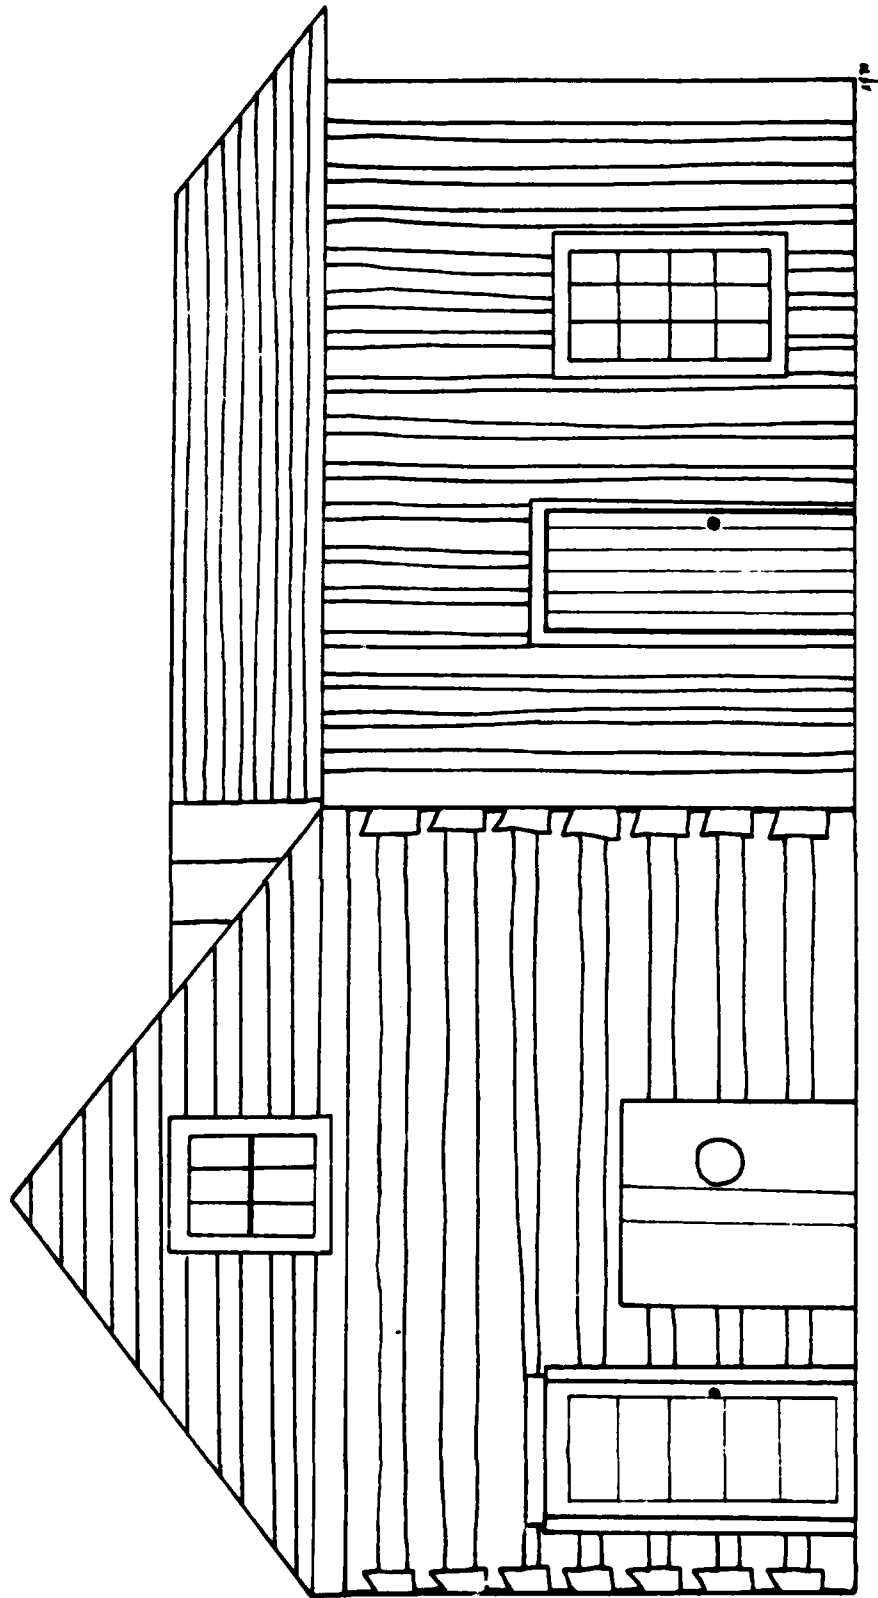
Drawing of northwest wall of dwelling on Tract 1014. Note removal of chimney.
